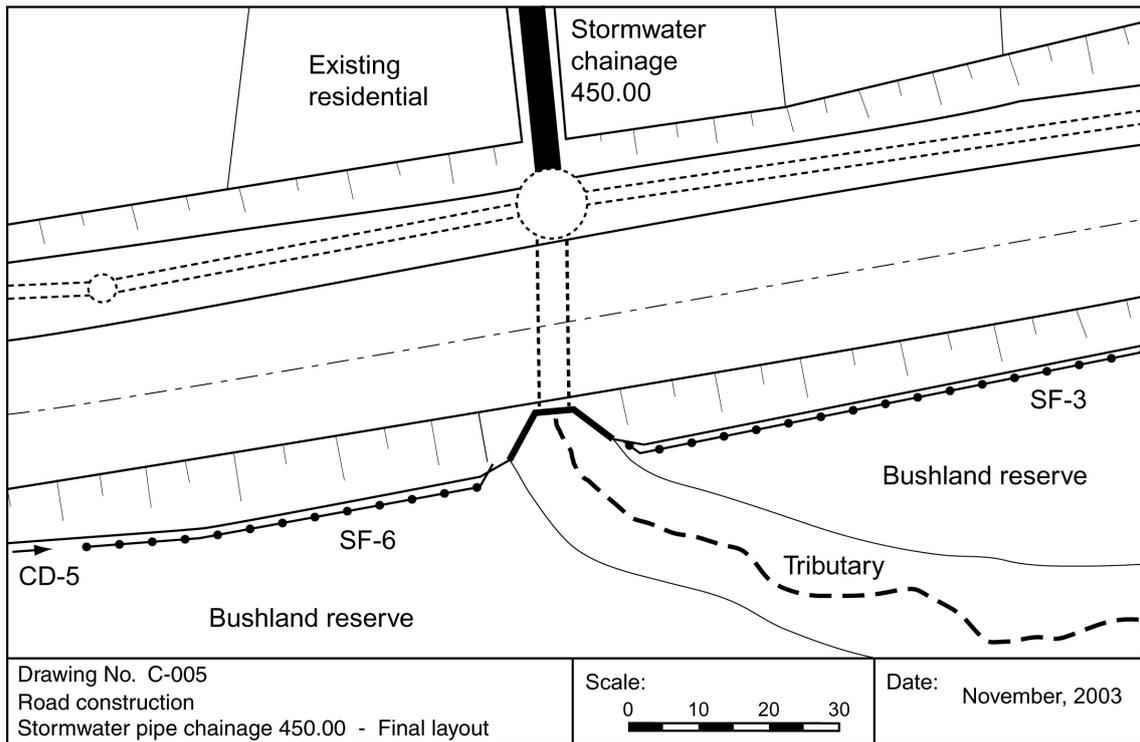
Final road layout at chainage 450.00 (Dwg C-005)
